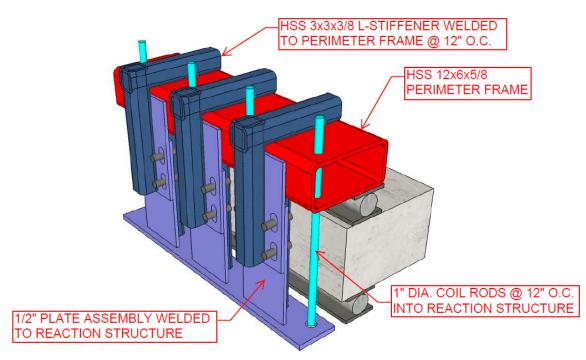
Steel Framing Set-Up 2 Layout (Isometric View)
